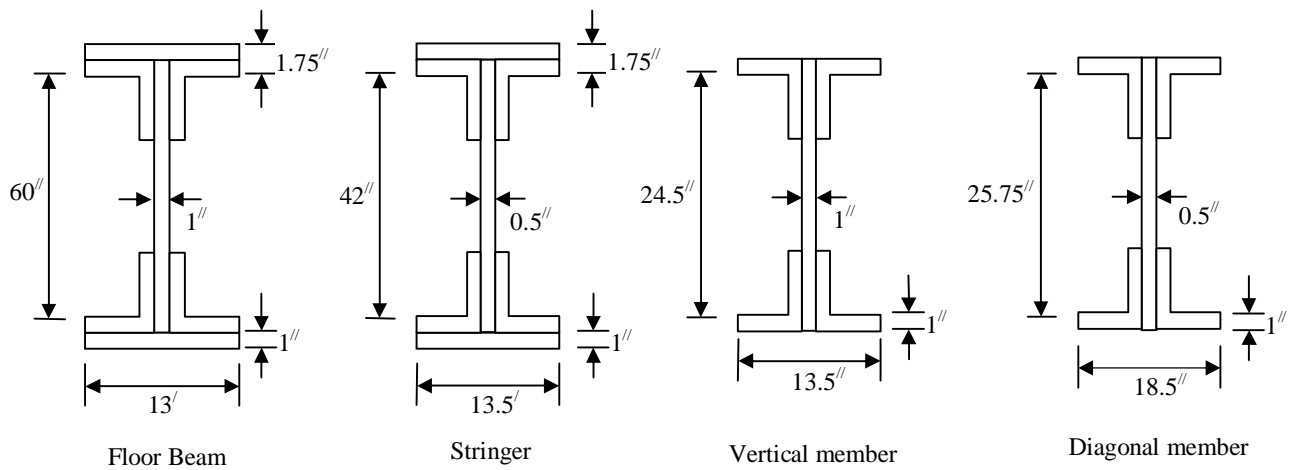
Cross sectional details of different members of Hardinge Bridge.
